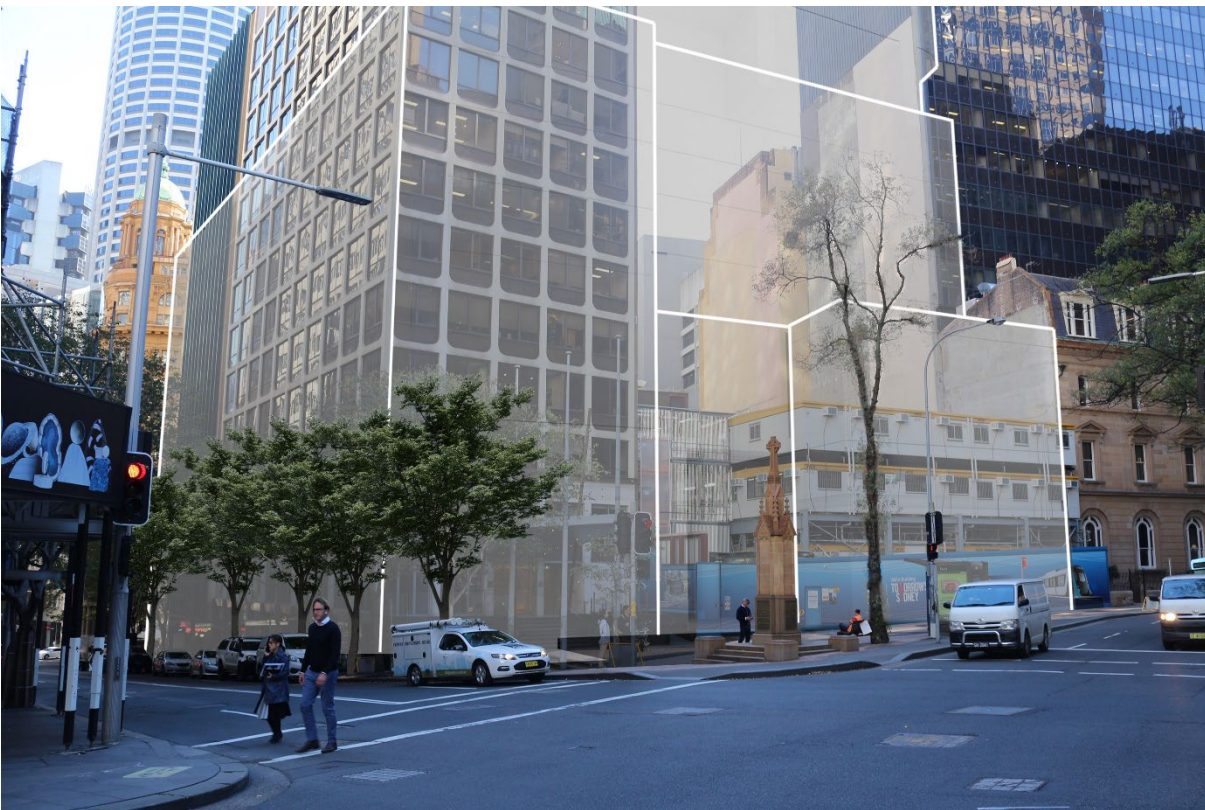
Existing view from viewpoint 5 (view north-west from corner of Hunter and Castlereagh Streets) – Hunter Street Station (Sydney CBD) eastern site. Extent of previous demolition (under the previous Sydney Metro West planning application) is shown in blue
